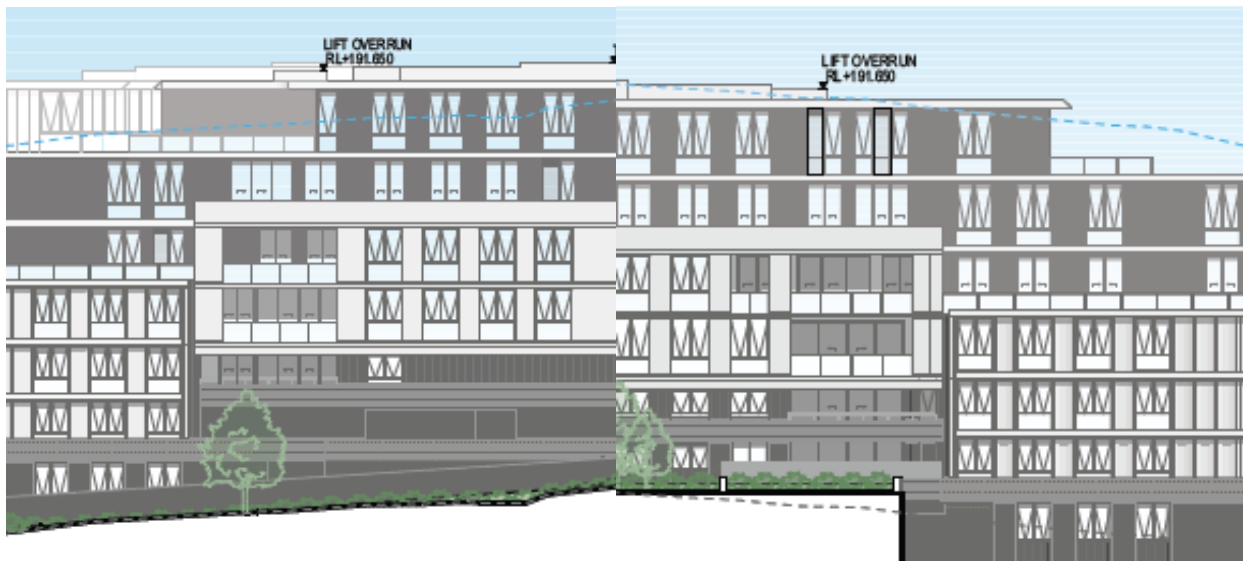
Extract of Building A Elevation (left) and Building B elevation (right) demonstrating partial 7th storey
